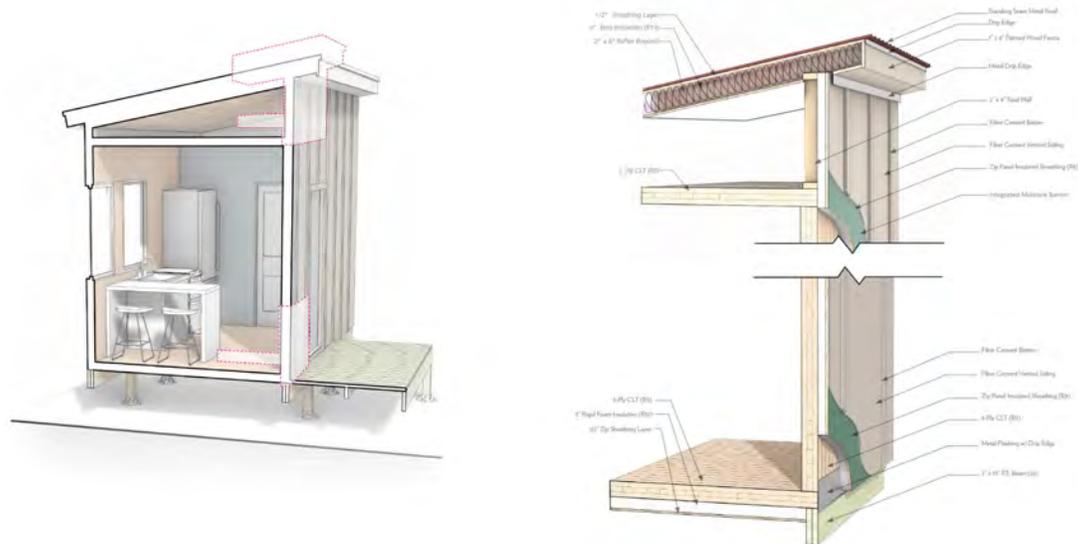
Cross-sections depicting unit finishes and on-site completion measures. Illustration by: (Ryan Bing 2021)
